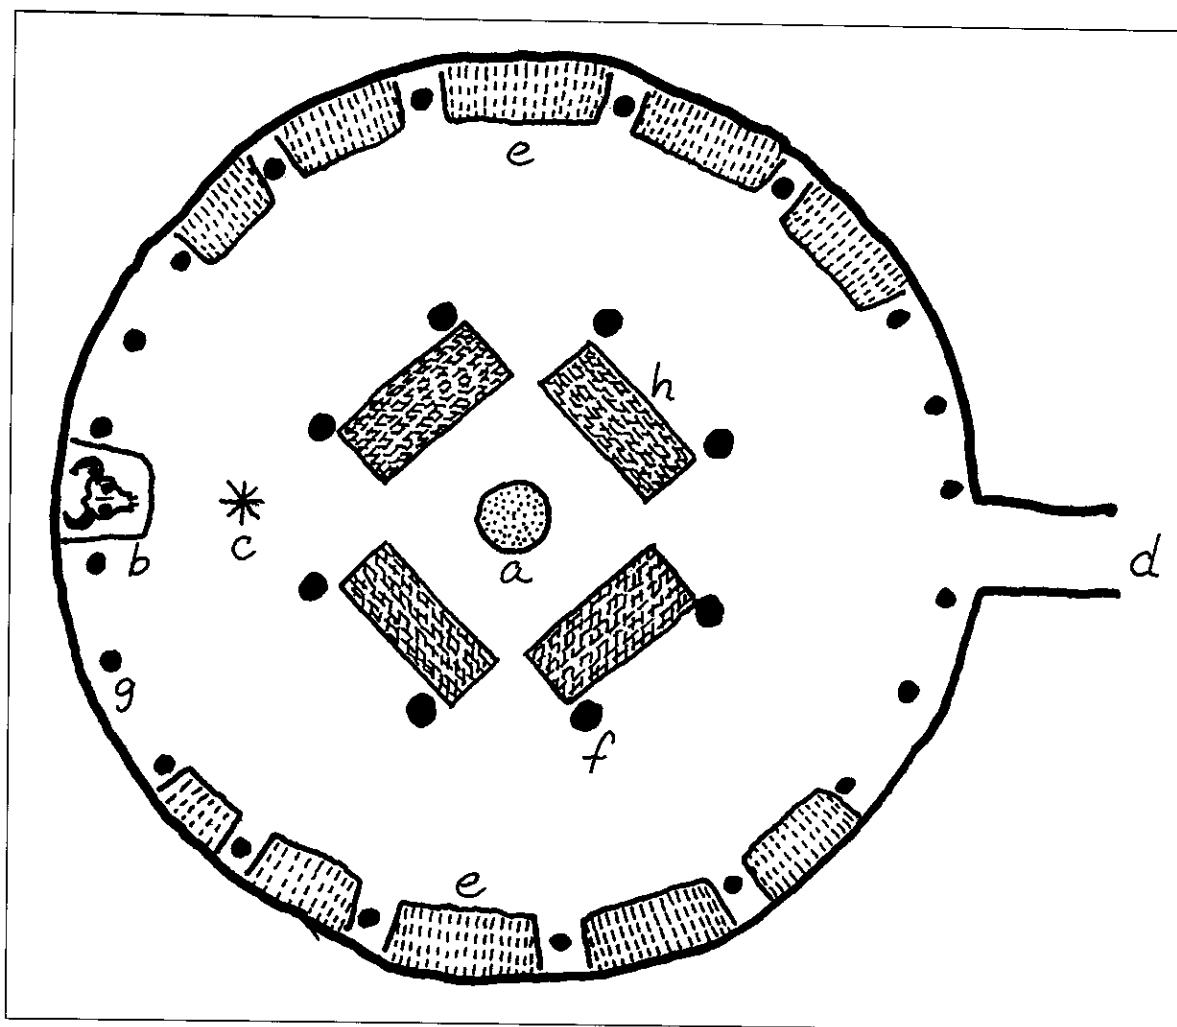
Stylized plan view of Pawnee earthlodge: a) hearth, b) altar, c) *wi-haru*, d) entryway, e) sleeping platforms and storage areas, f) central support posts, g) secondary support posts, h) mats around central hearth.
